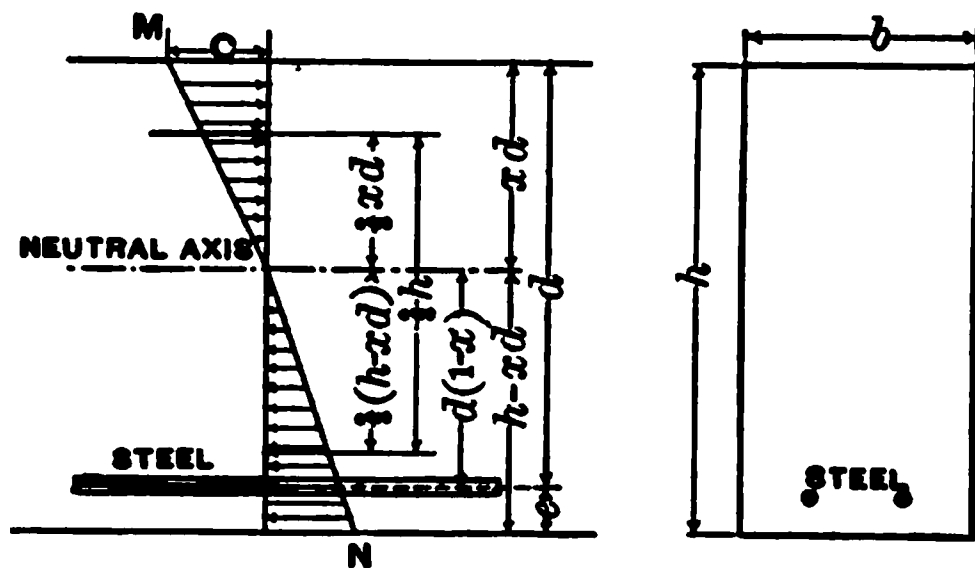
Resisting Force with Steel Bearing Tension. (See p. 565.)
